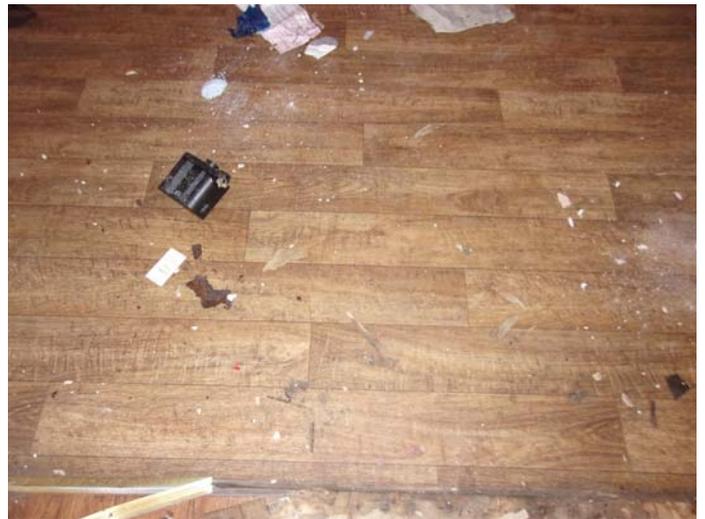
Wood grain vinyl floor & no mastic in the dining room – top layer
